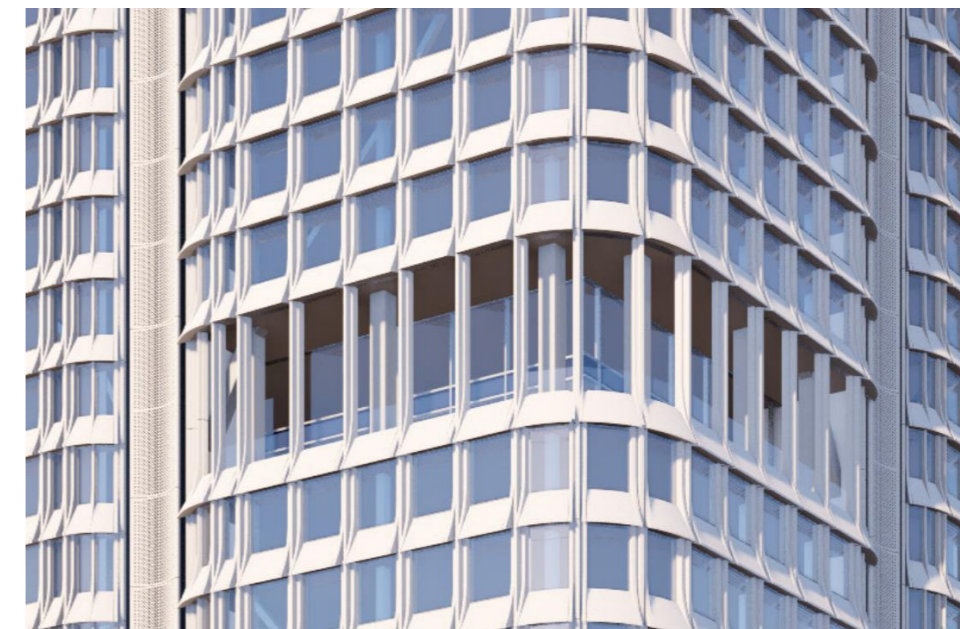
Example of amenity space glazing adjacent to a terrace area showing shading provided by the projecting storey above, and the structure.
